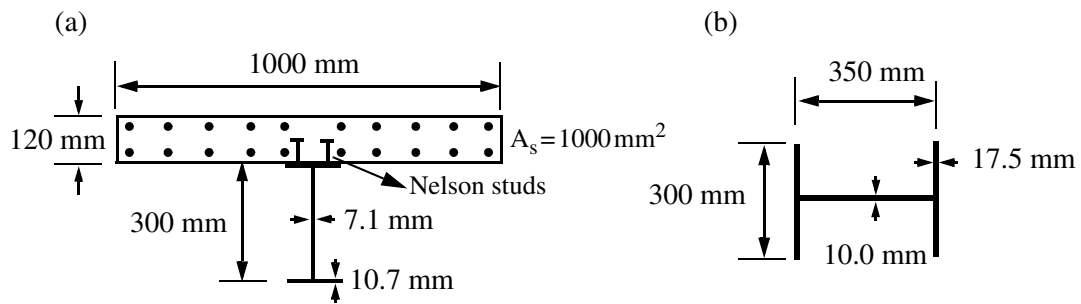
Cross-section properties of the steel-concrete frame structure: (a) composite beam cross-section, and (b) steel column cross-section.
